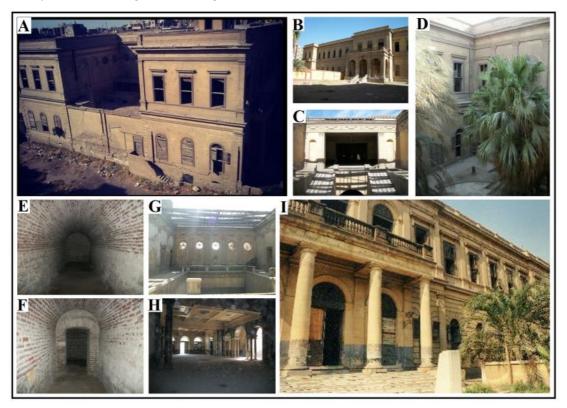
General views of Omar Toson palace showing: A) North-eastern façade, B) South-eastern façade, C) Stairs to the second floor, D) the internal courtyard, E) long rectangular corridors in basement, F) semi-circular brick masonry vaults, G) damaged roofs in the second floor, H) major corridor in the second floor I) south-eastern (main) façade
